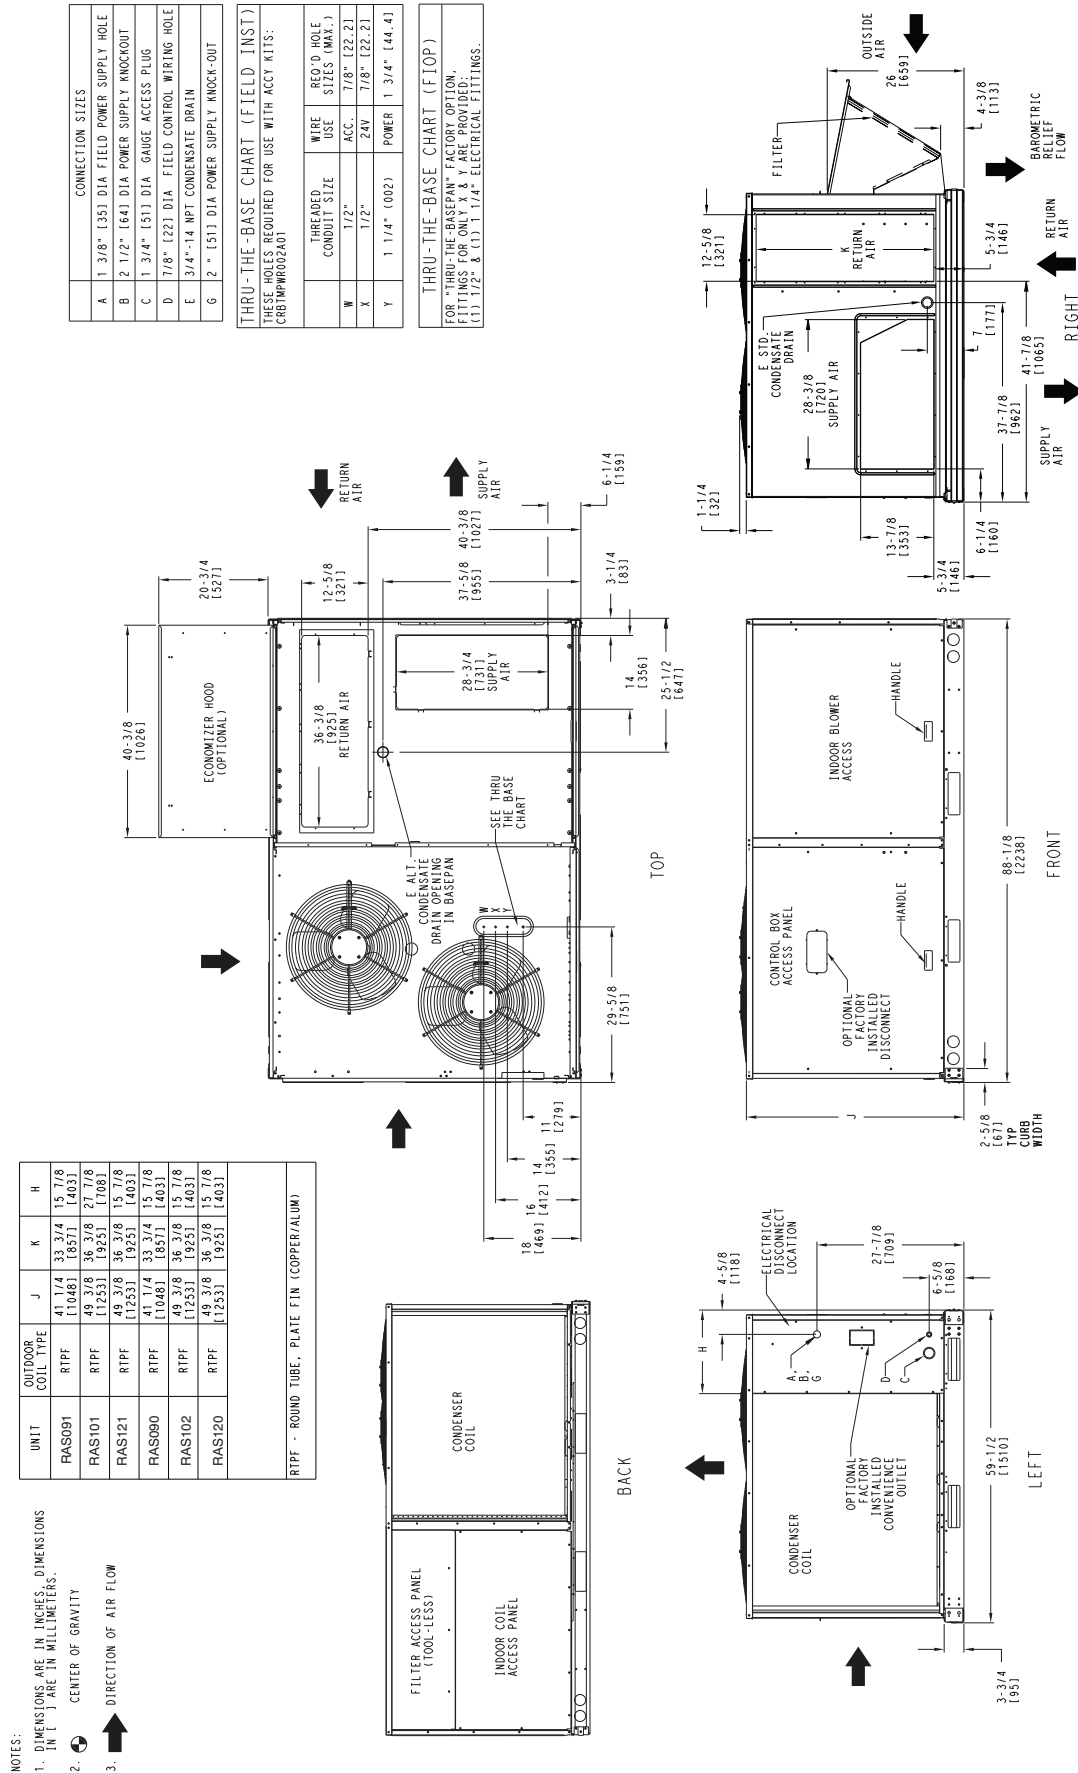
Dimensions RAS 090-121 (Sheet 1 of 2)
